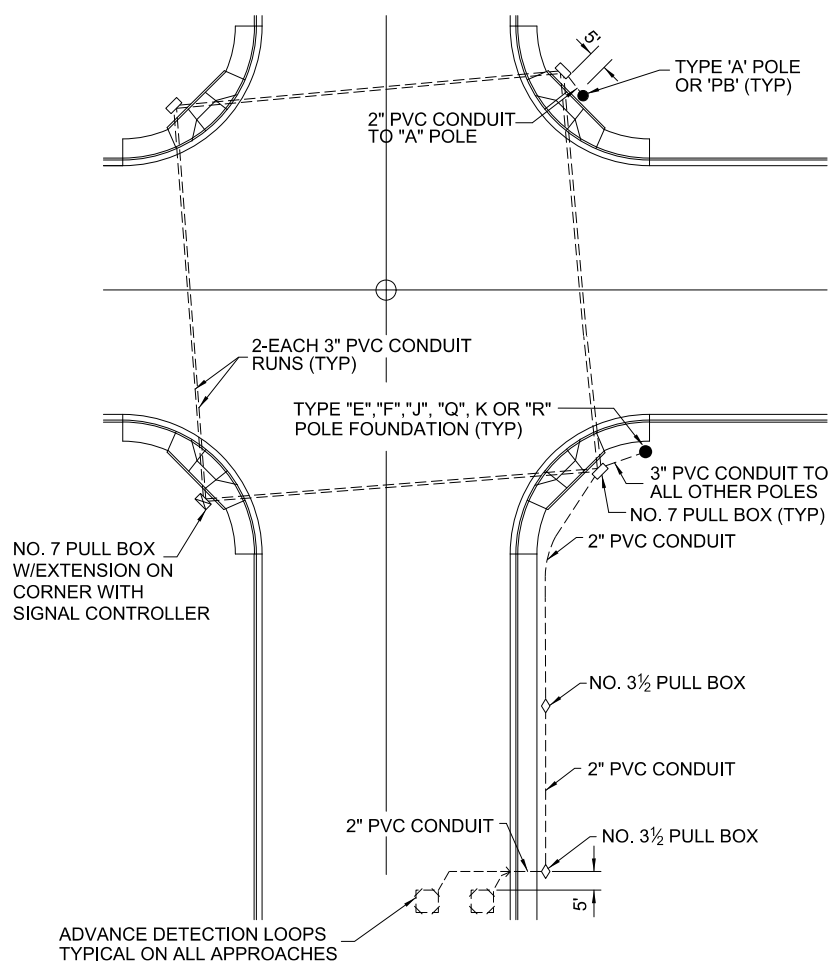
TYPICAL PULL BOXES AND CONDUIT
